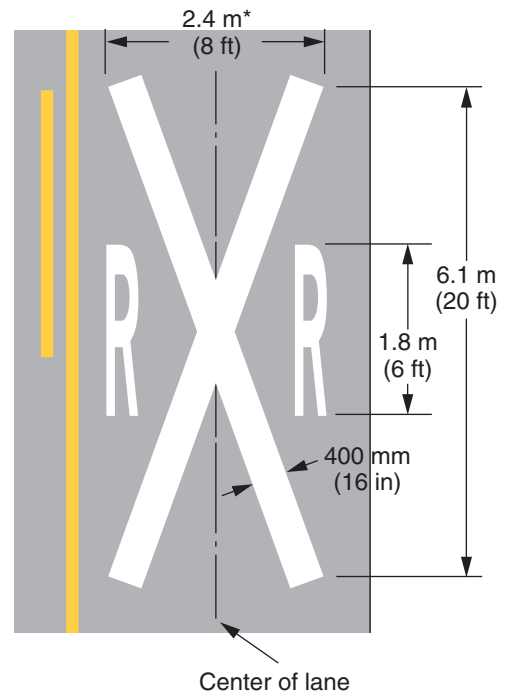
C-7. Highway-Light Rail Transit Grade Crossing Pavement Markings
